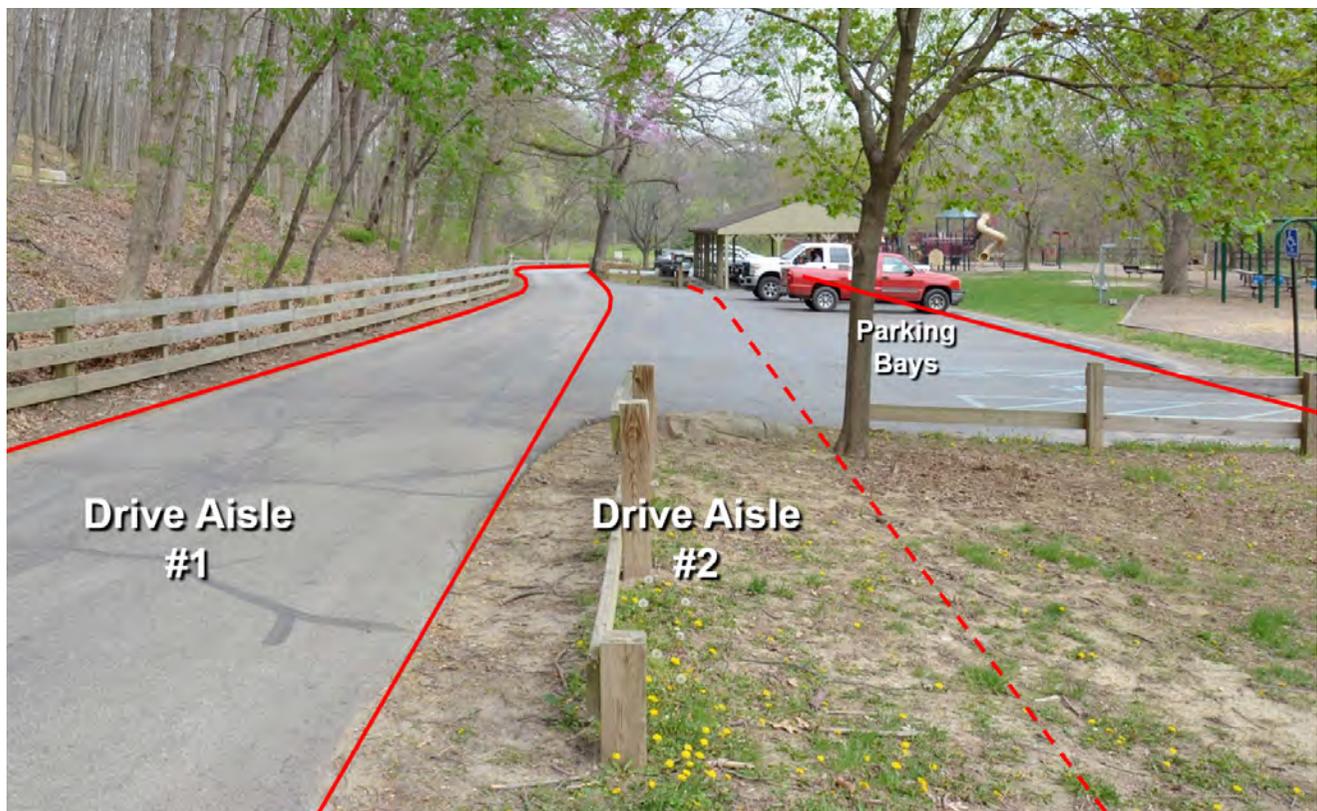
Graphic illustrating the proposed addition of a second drive aisle to the main road within the park space.
